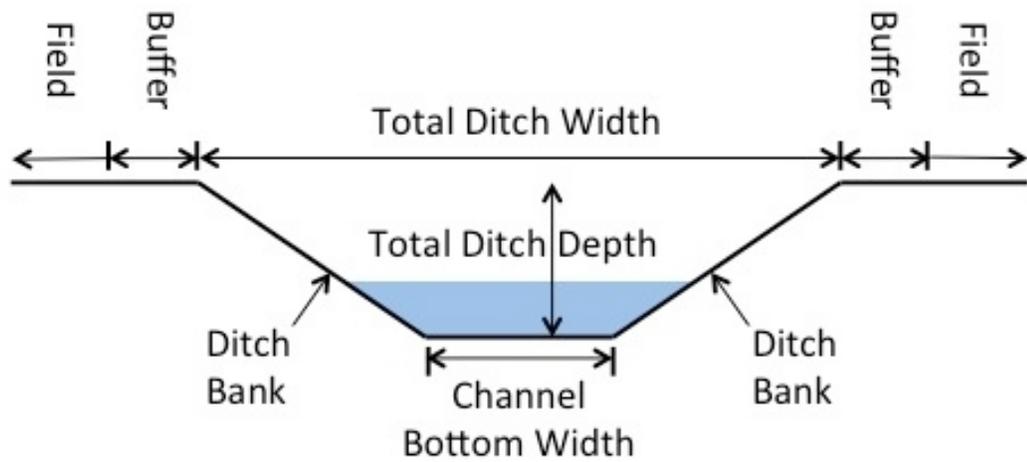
A Typical Conventional (Trapezoidal) Drainage Ditch Cross-Section.
